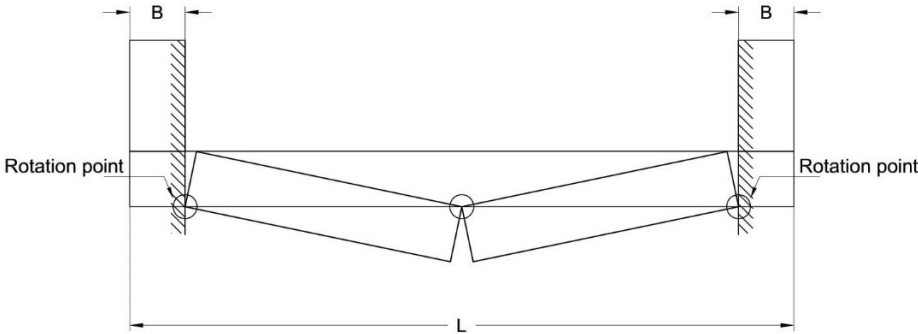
36 – Collapse mechanism for the rigid beam between rigid orthogonal walls
